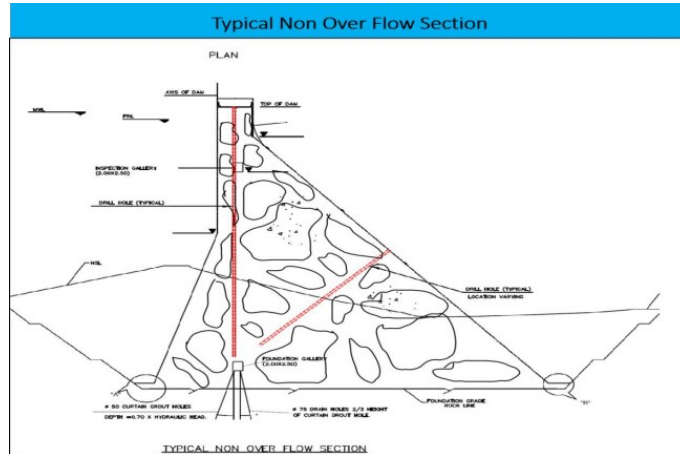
Drilling of Holes (Vertical from top or inclined from d/s face)
